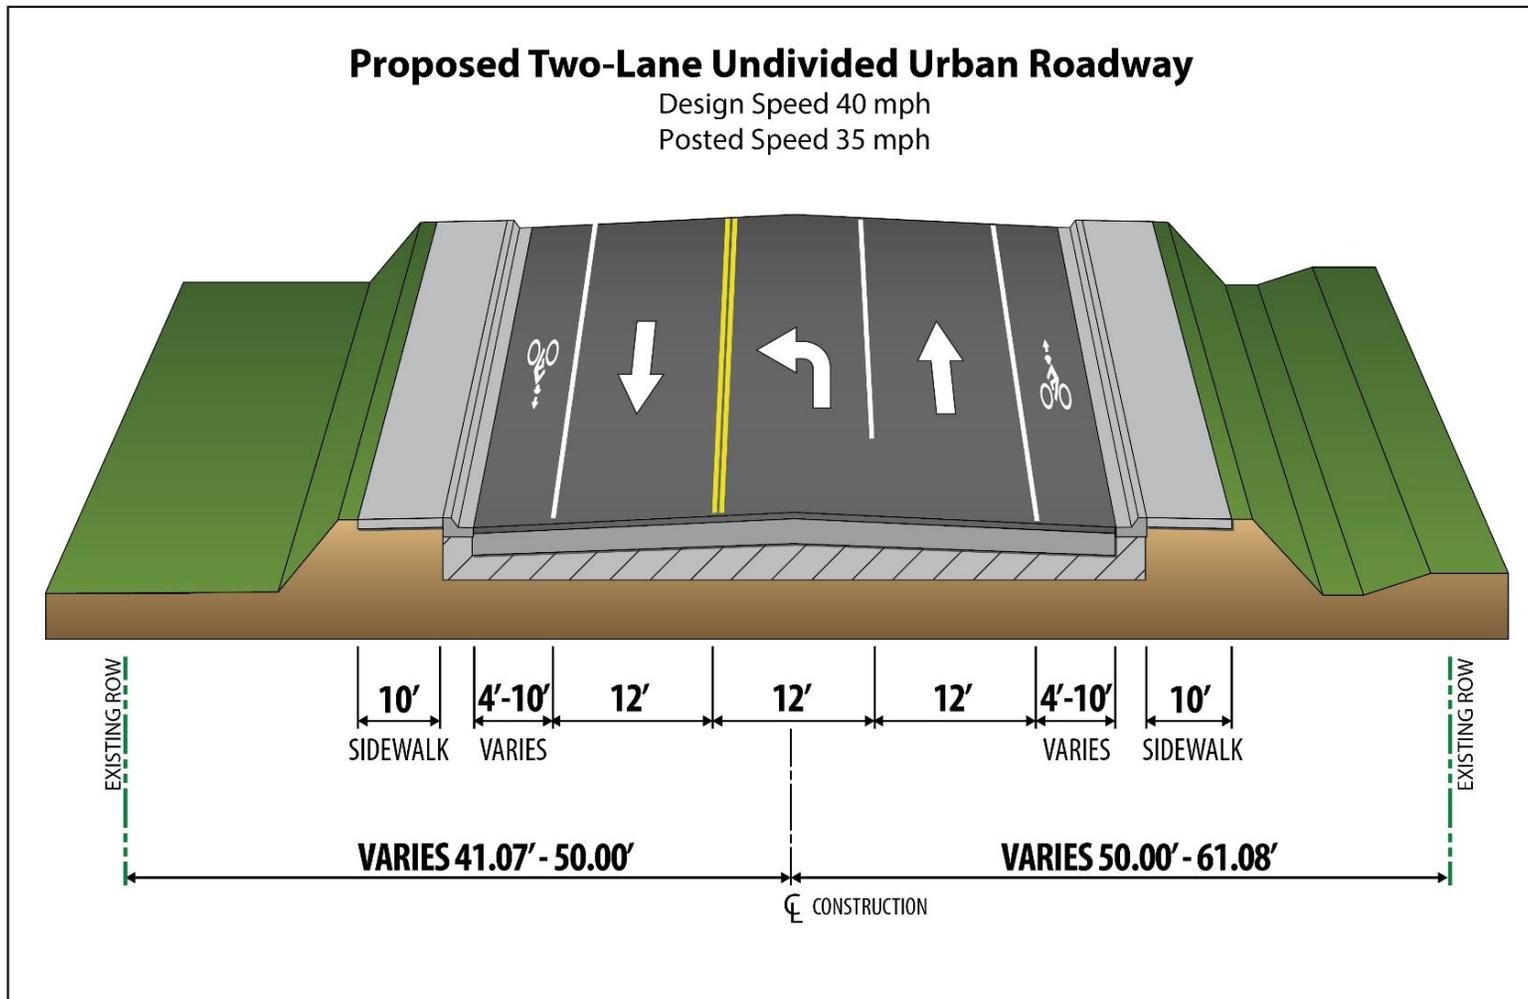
Proposed Western Approach Roadway Typical Section (Looking East)
